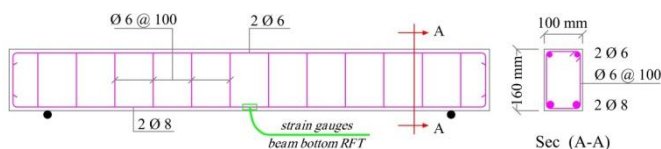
a] Reinforcement details and location of internal mounted strain gauges for all tested specimens.
